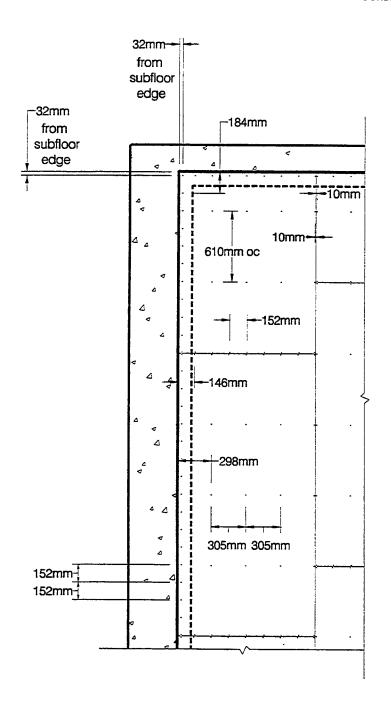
Screw pattern for face layer subfloor, joists 610 mm o.c (10 joists)
